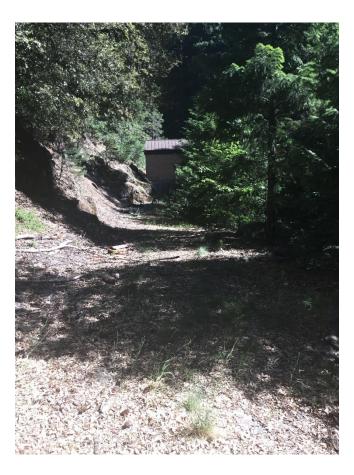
Location of New Access Road and Turn-Around behind the Spillway 20 Building
